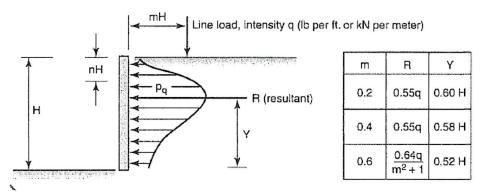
Pressure distribution against vertical wall resulting from line load of intensity q.
